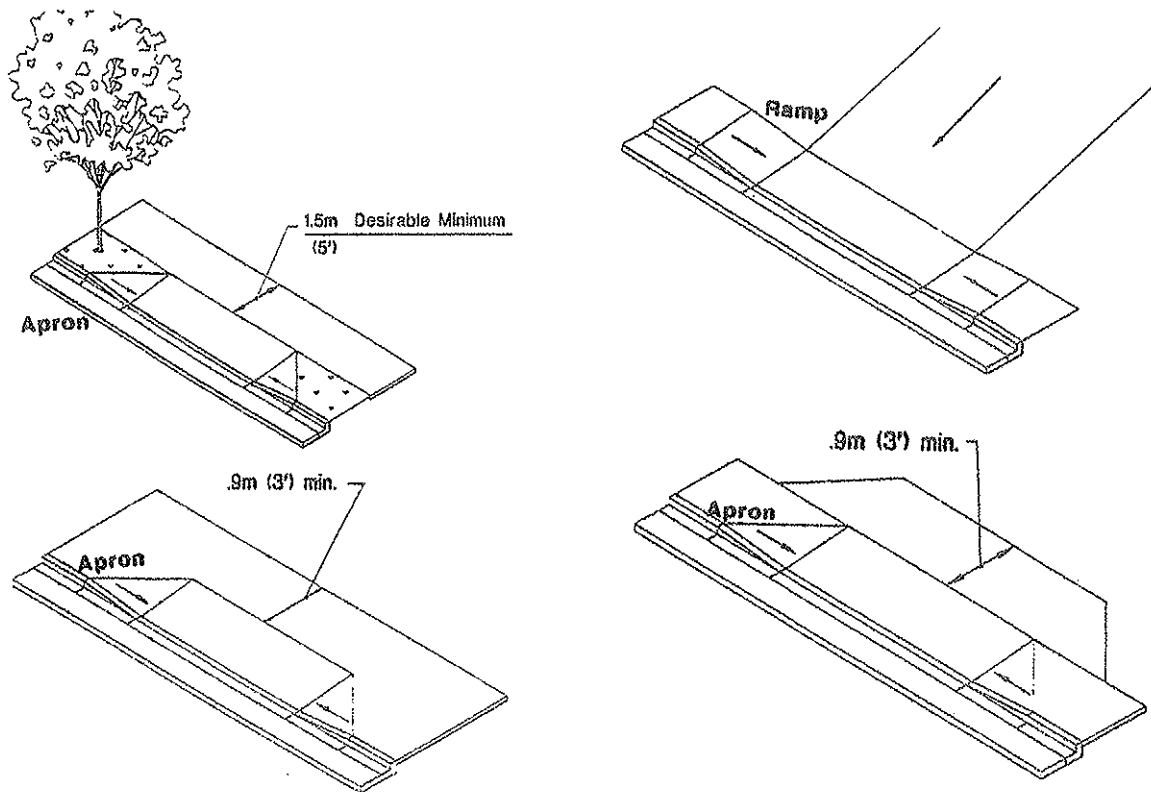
K - Examples of Acceptable Driveway Openings Next to Sidewalks/Pathways
